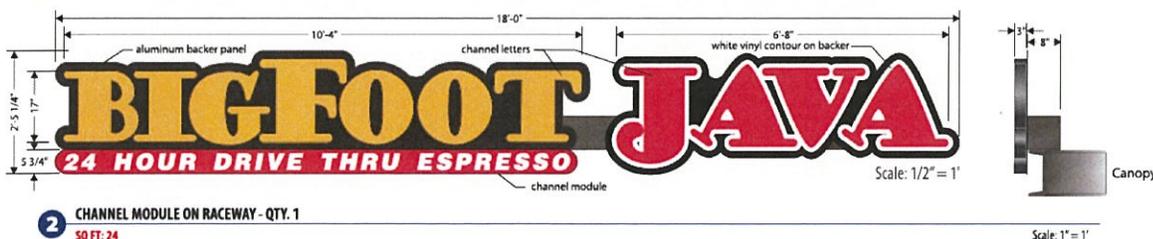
Proposed Building-Mounted Drive-Thru Sign (Signs #3a and 3b on Exhibit 4 Map)
